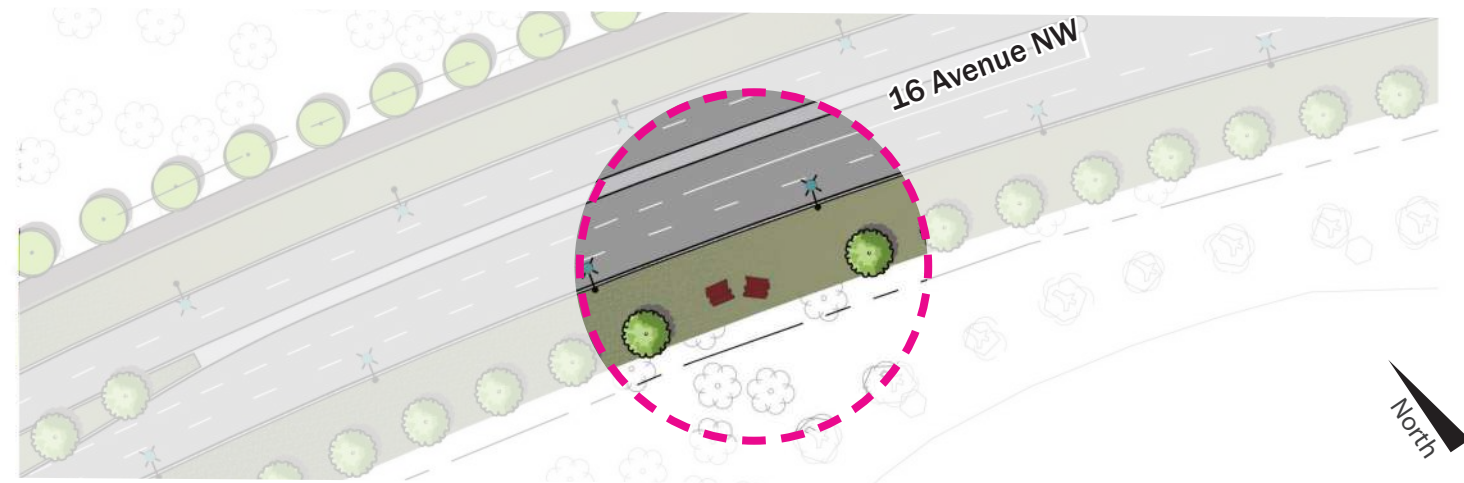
WEST GATEWAY - POTENTIAL PLACEMAKING LOCATION
